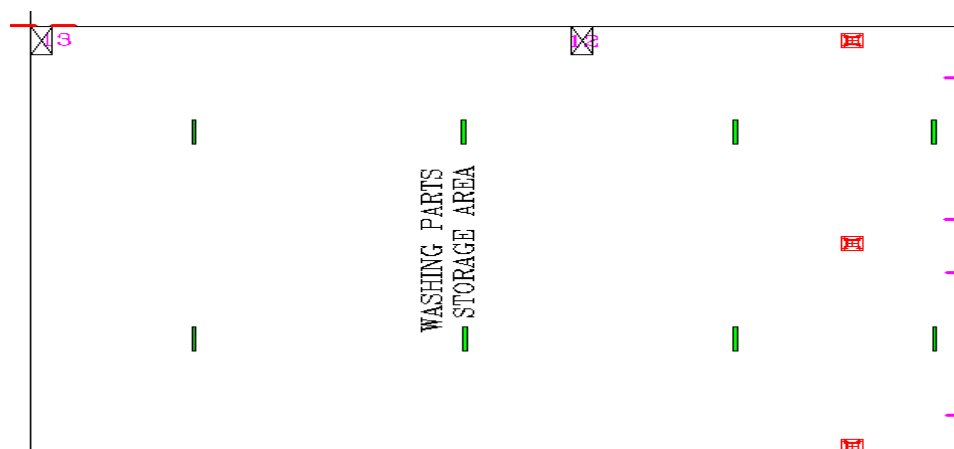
Lighting Layout for Washing Parts Storage Area
